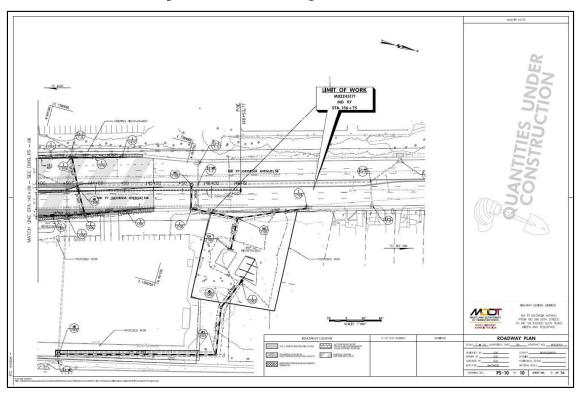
Plan View – Georgia Avenue north of Forest Glen Road
